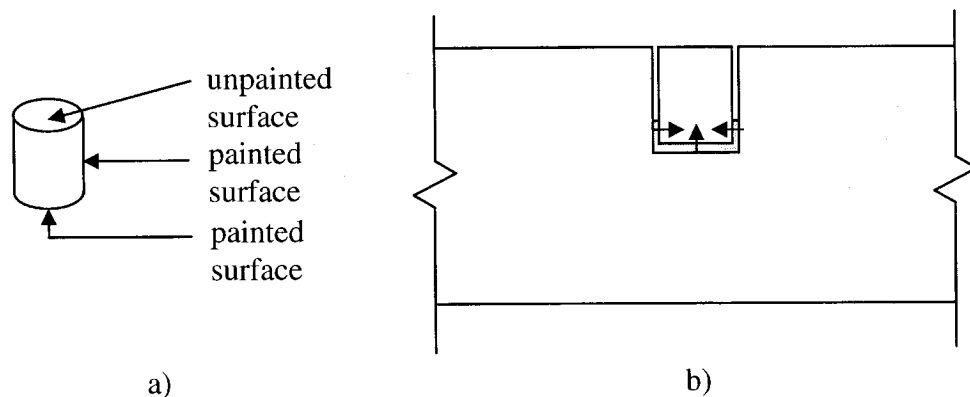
a) Bottom plate gravimetric sample showing the painted and the unpainted surfaces. b) Section view of the center horizontal or right horizontal bottom plate gravimetric samples nestled within the bottom plate, showing the direction of moisture flow into the sample.
